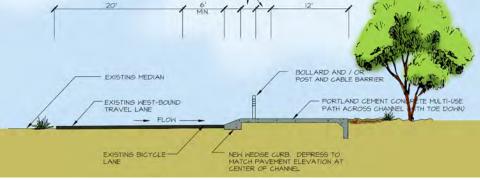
C: Typical Greenway Cross-Section Crossing of Atturbury Wash at Escalante Road
